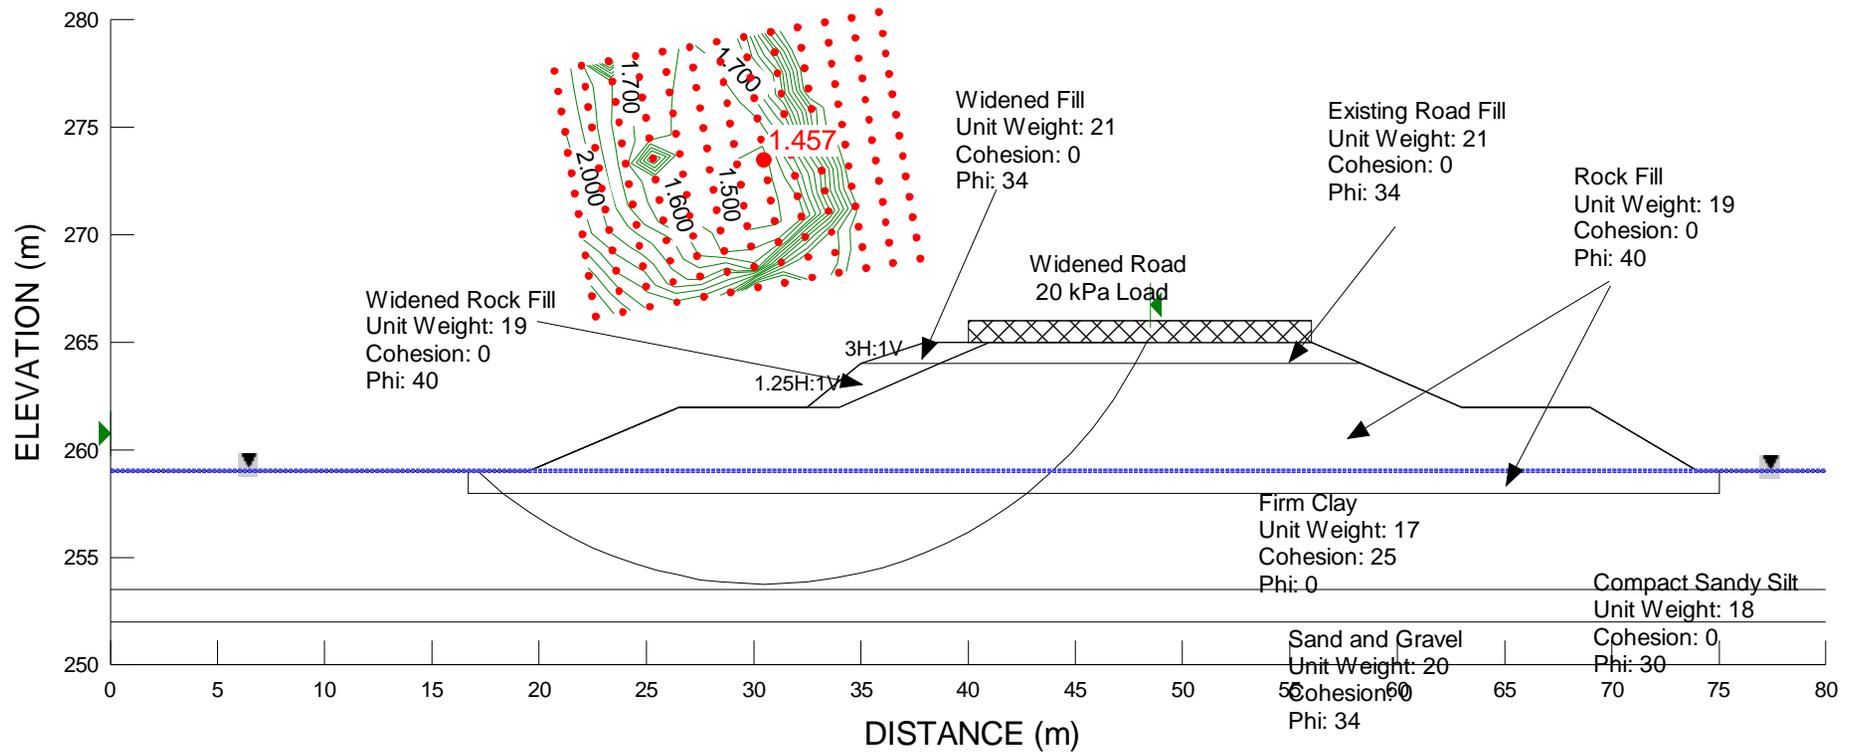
Slope Stability Analysis of Section at Station 18+875 - 3.0 m Road Widening (End of Construction - Slip Surface within Westbound Lane)
